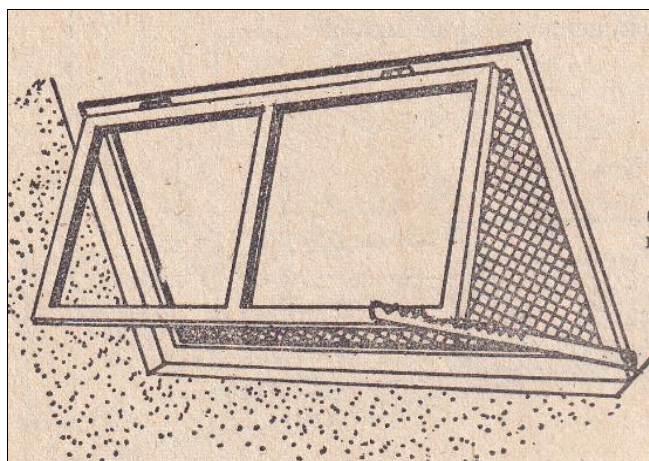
Poultry-house window and its opening mechanism (Simonović, 1971) ^[46]
